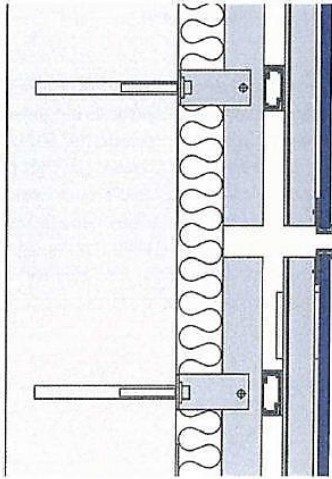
Façade section of two-sided linear-supported fixing (Planning and installing, 2008).
